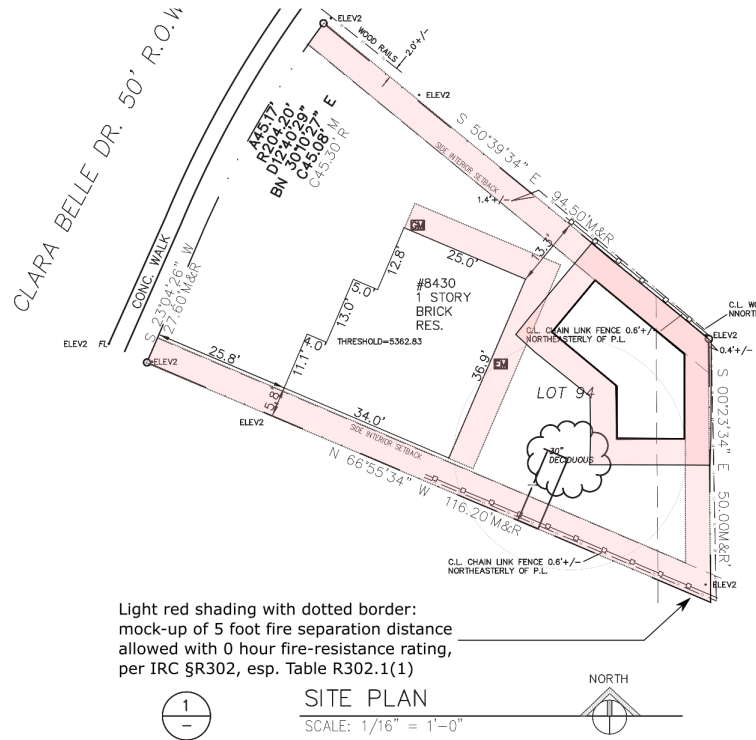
Site plan from [Figure 4](#) showing 5 foot fire separation distances (per IRC §R302) in red. As explained in the text, we would require costly fire-rated construction and/or retrofit if we observed a 10 foot rear setback and kept the ADU layout the same.
